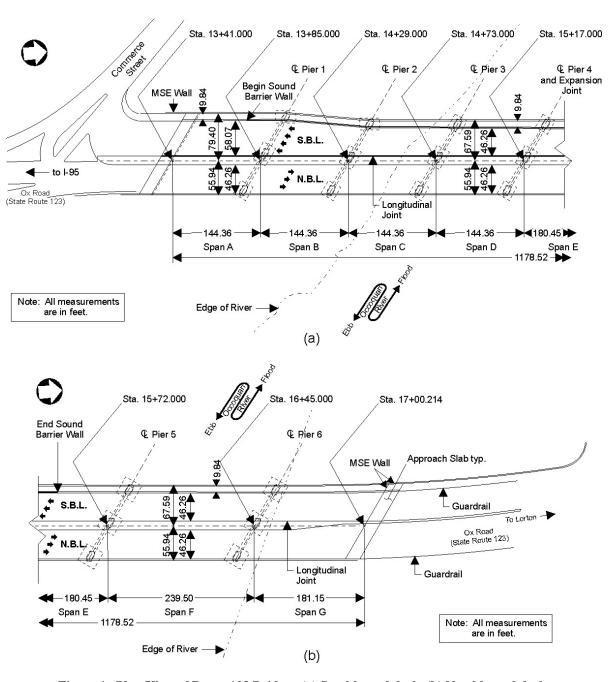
Plan View of Route 123 Bridge. (a) Southbound deck, (b) Northbound deck.
